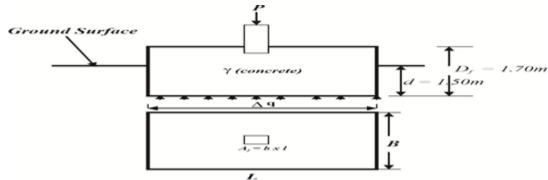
Net Pressure on footing with backfill (assuming top of Raft footing above ground surface)
